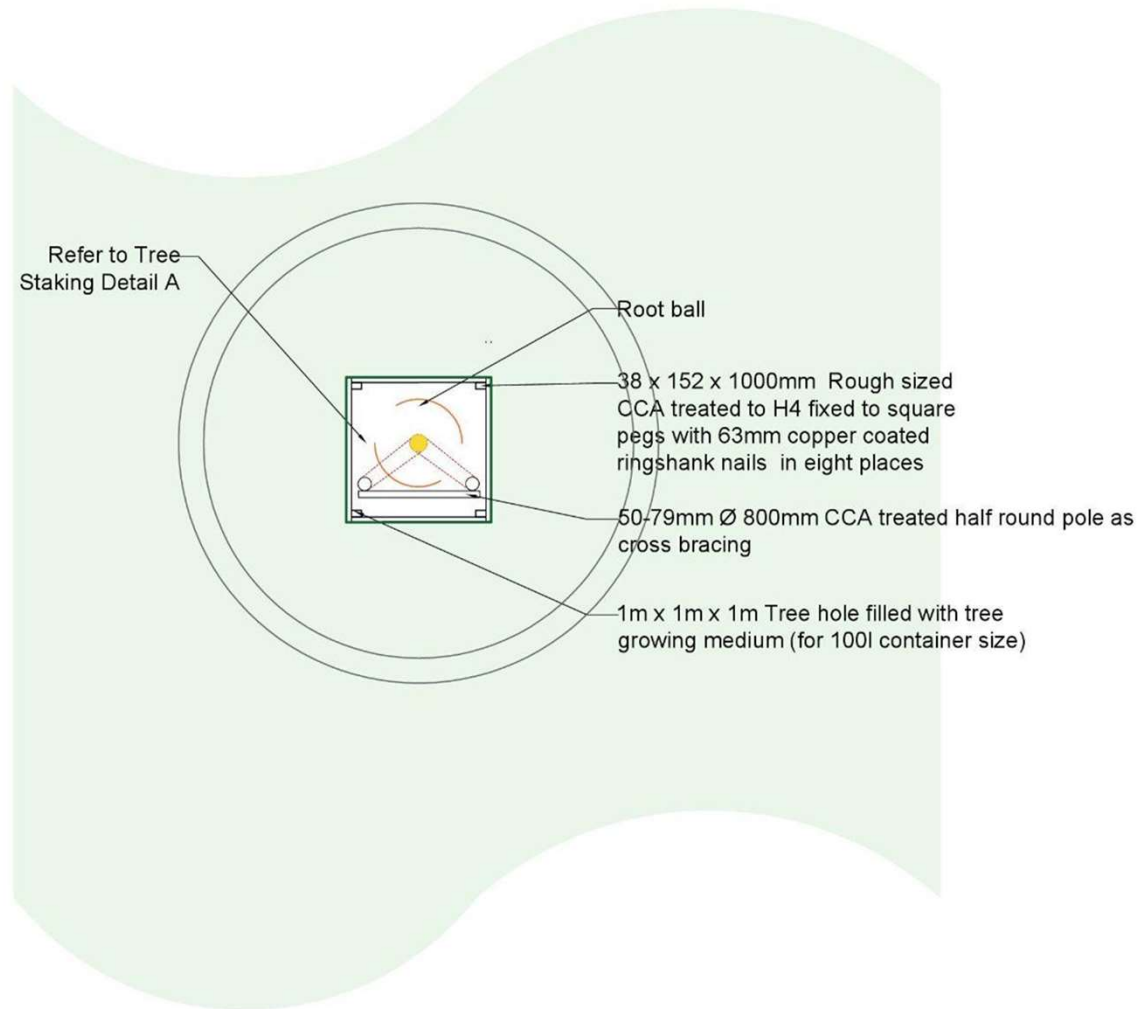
Softscape Tree Detail Plan (Viridian Consulting, 2024)
